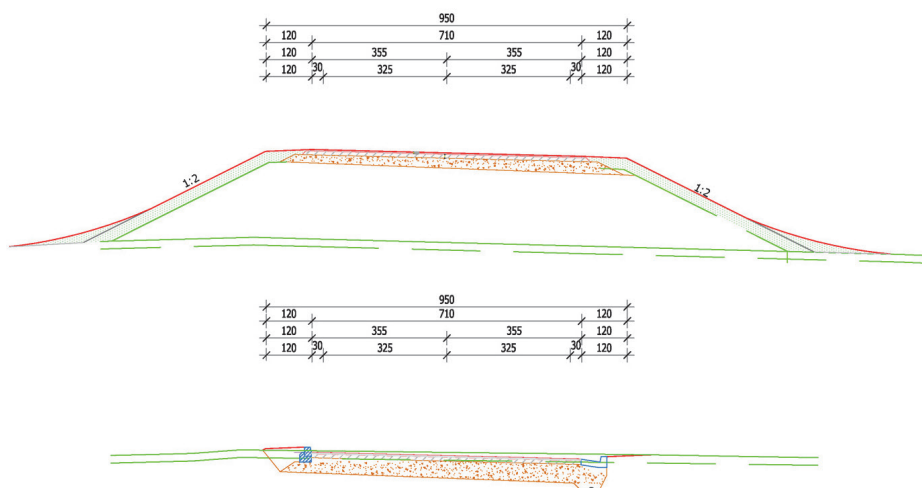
Normal cross sections for state road in both embankment and excavation scenarios
